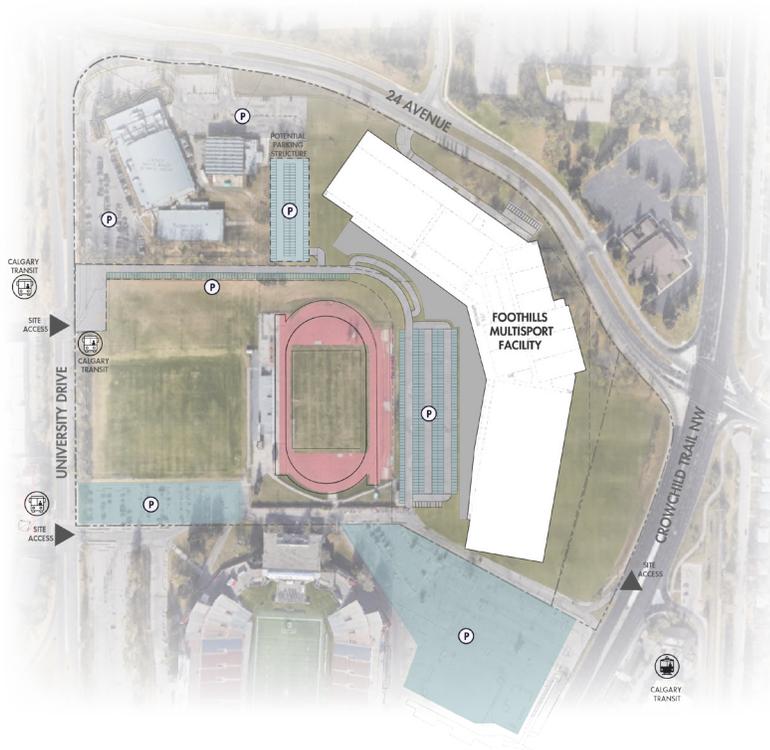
Foothills Multisport Fieldhouse site test-fit, site access
